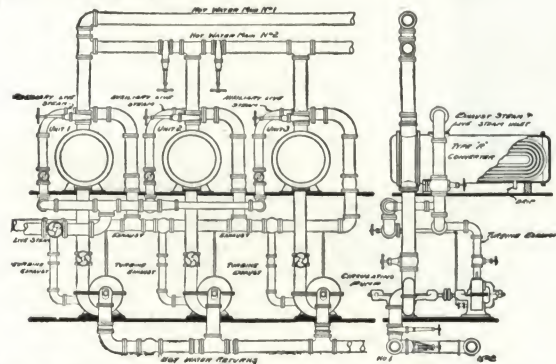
Typical Piping Plan of 3 Type "R" Converter Connected Parallel
